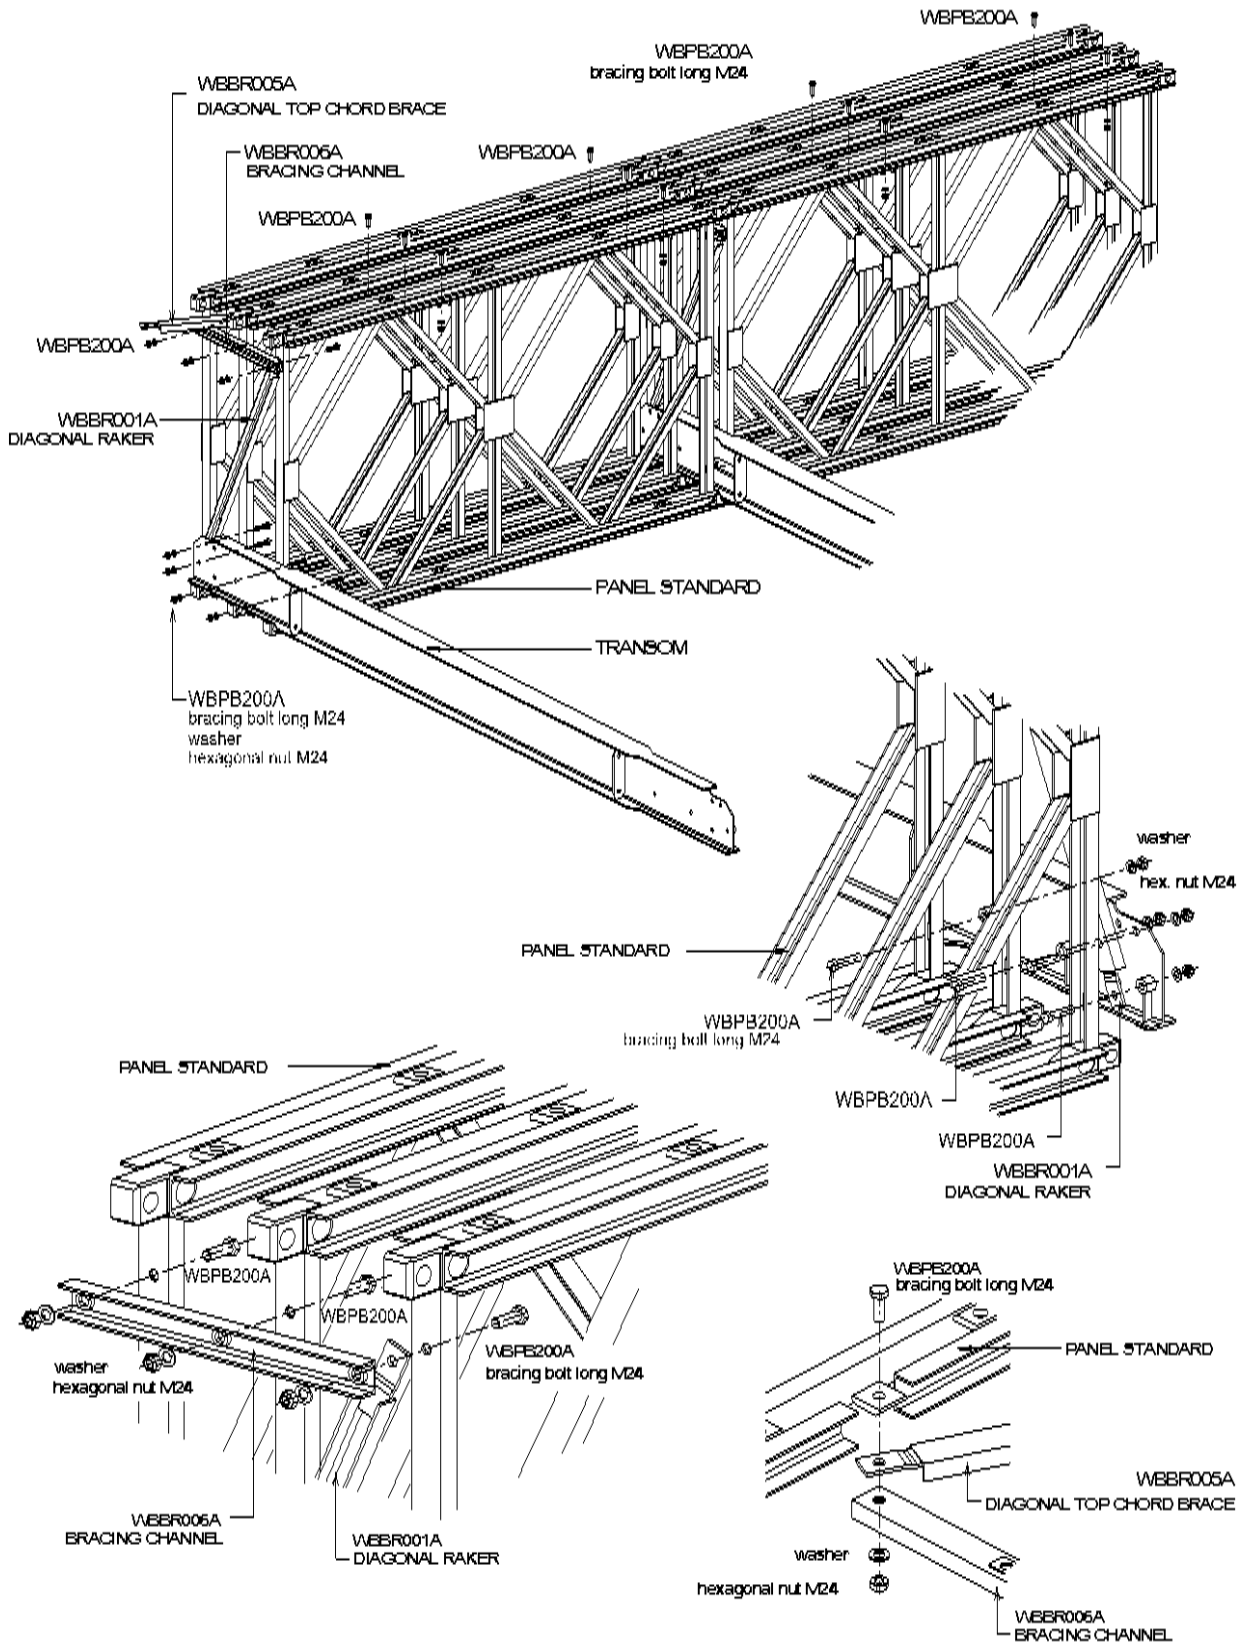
CONNECTION OF PANEL BRACINGS AND THE TRANSOM TO THE PANELS OF A TS-BRIDGE
